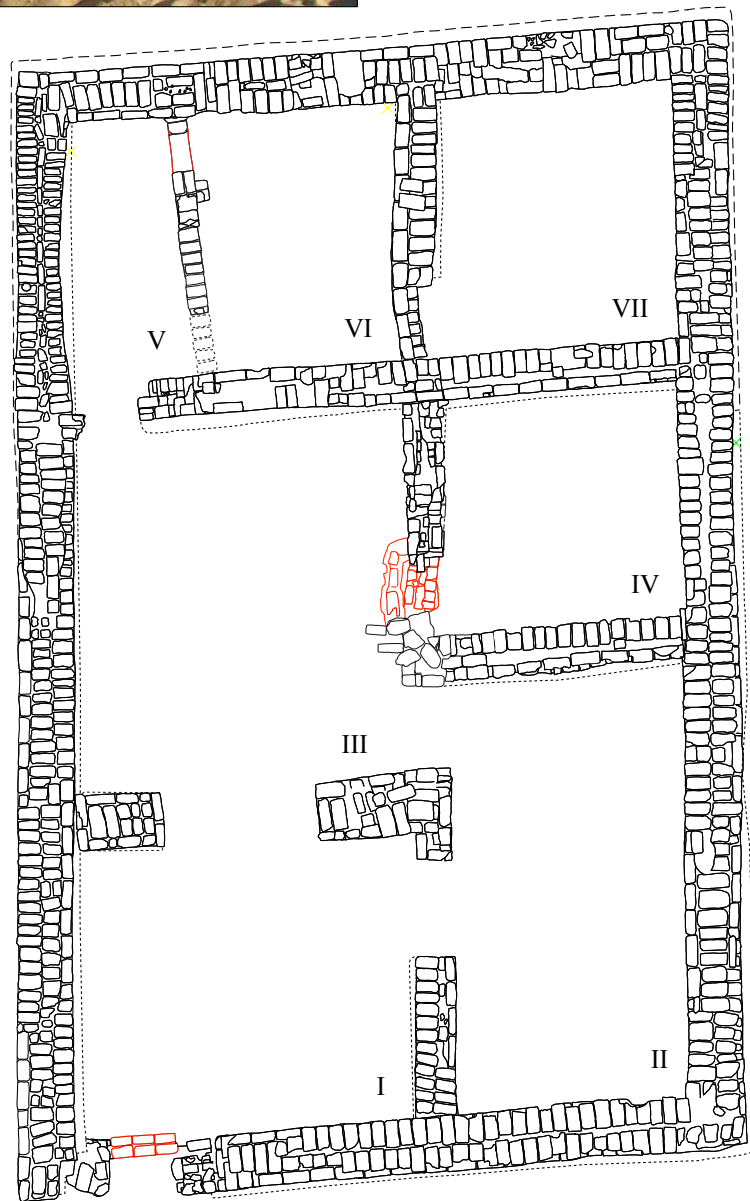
Building A2, features of the final structural phase (scale 1:100).
